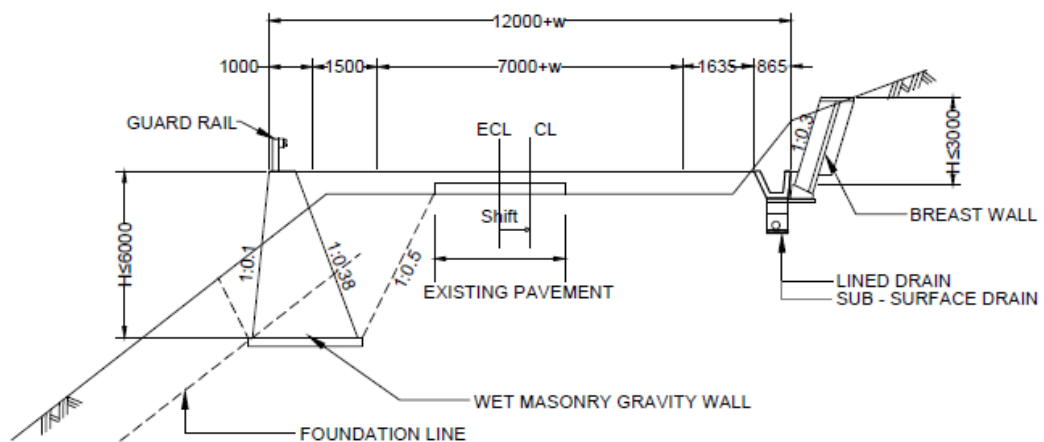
(5): Typical Cross Section – Type 5 (Mountainous and Steep Terrain)
